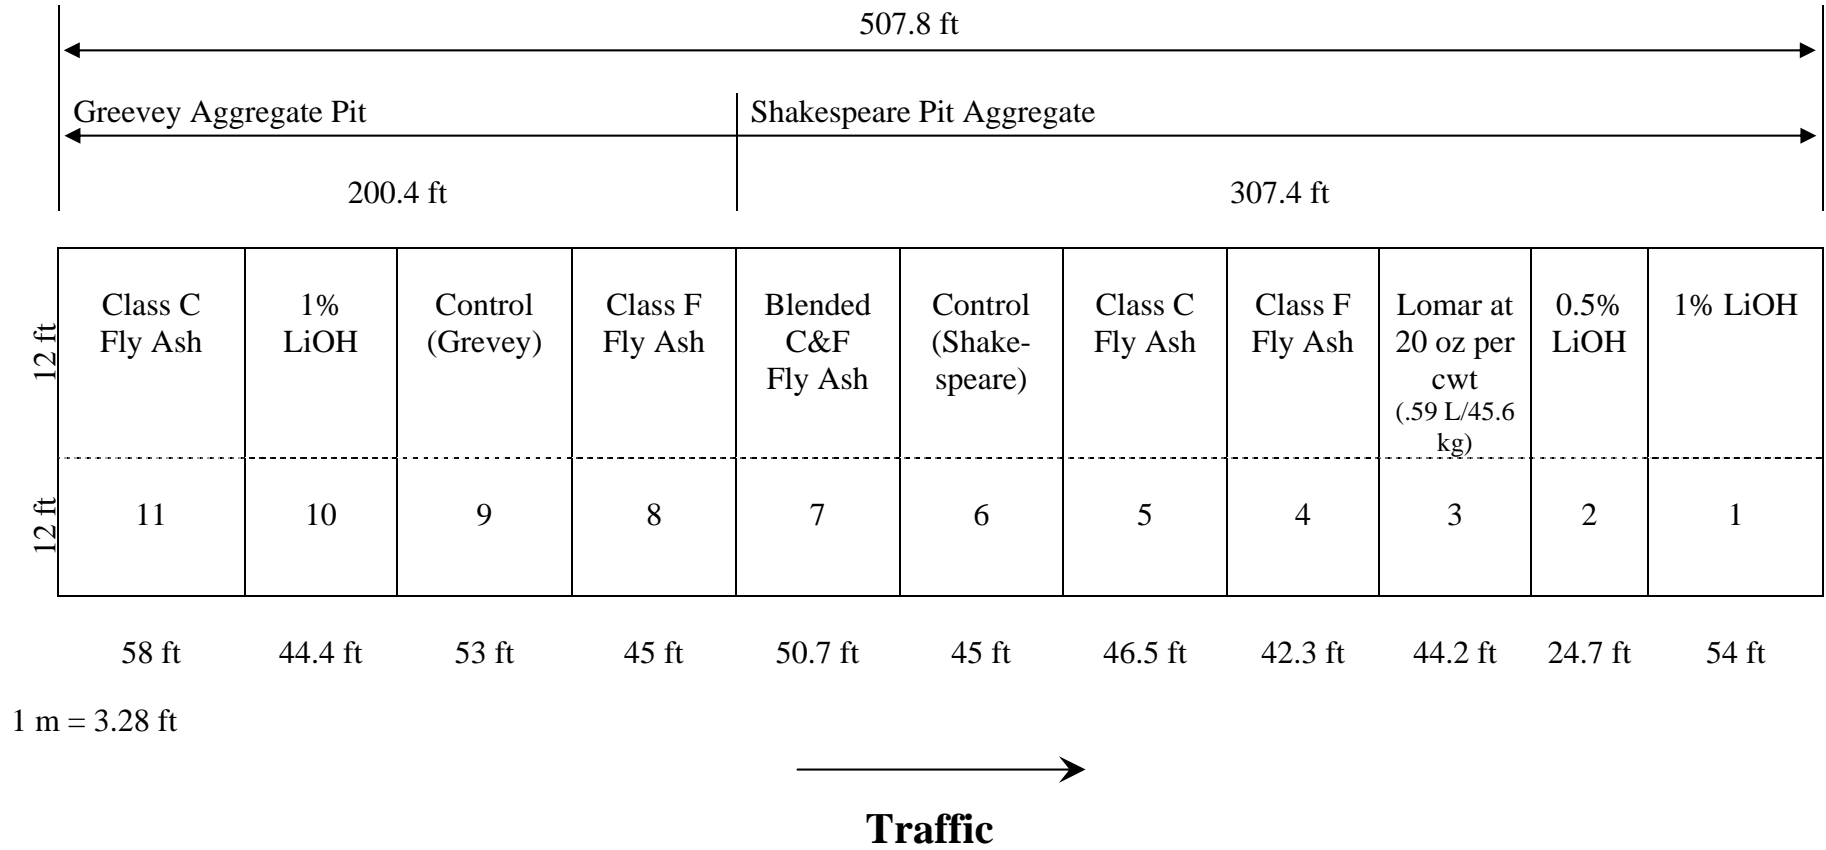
New Mexico ASR test section layout—westbound approach slabs to Lomas Boulevard (State Route 352) bridge over I-25.
